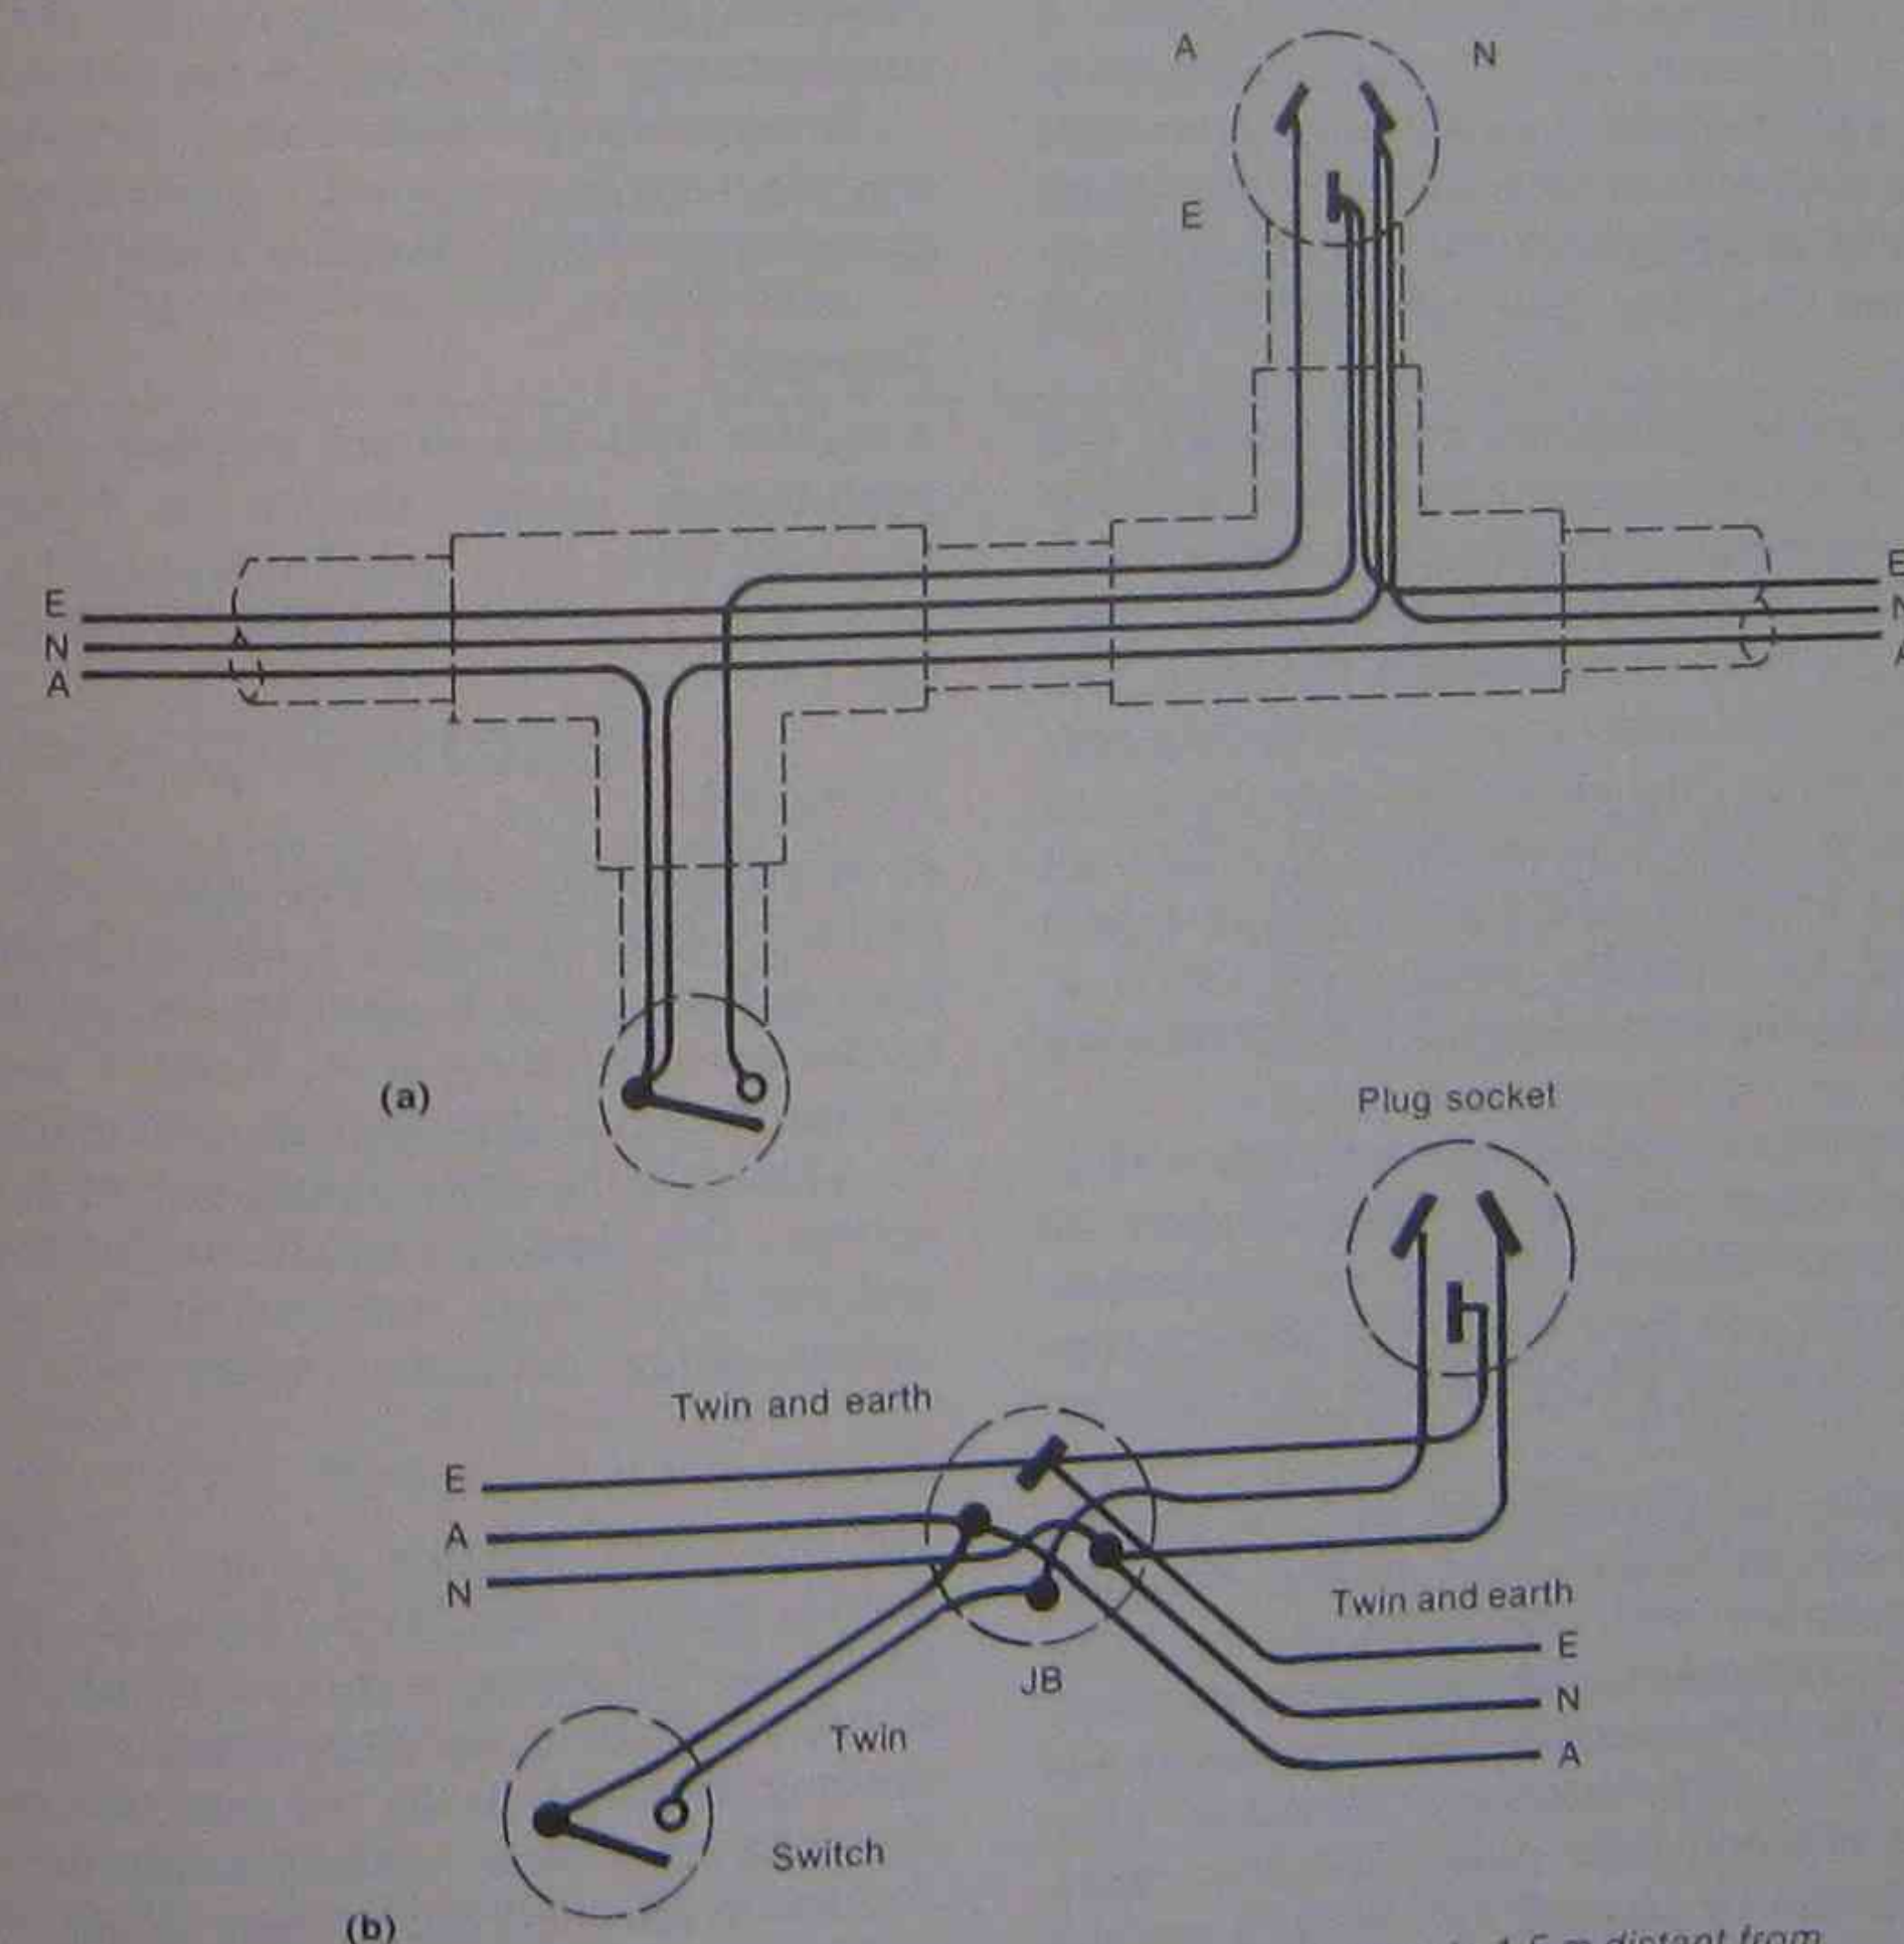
(a) and (b) A power outlet may be controlled by a switch up to 1.5 m distant from the outlet, provided the outlet is visible from the switch
